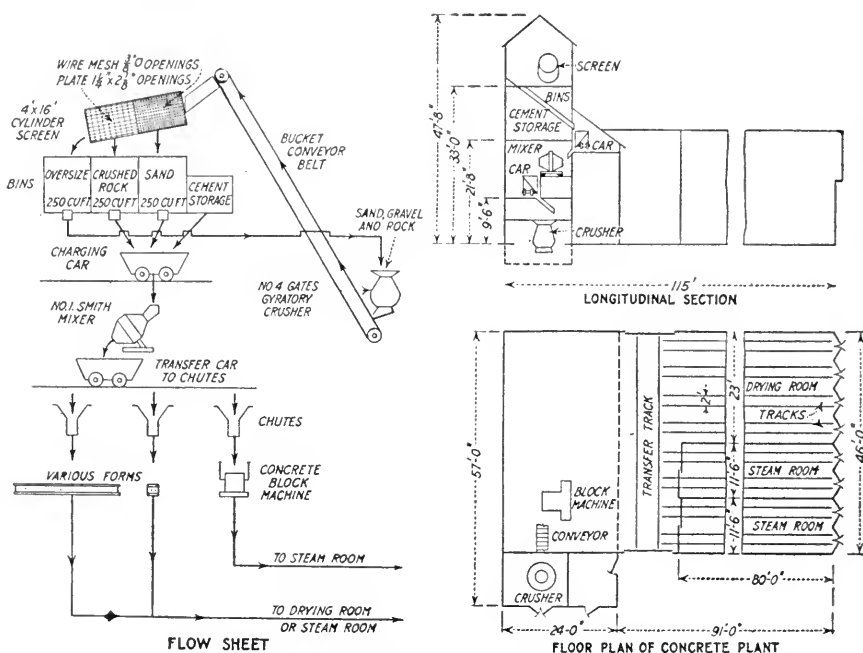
HANDLING MATERIAL AT MANUFACTURING PLANT.
